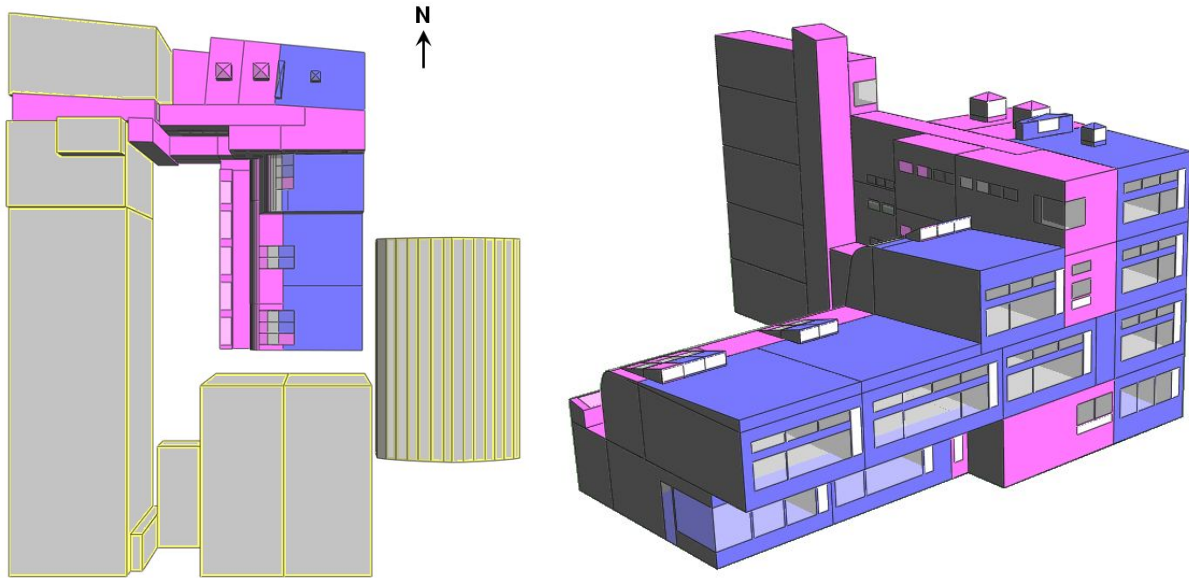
Plan view of the school with surrounding buildings (left), axonometric view of the school (right).
